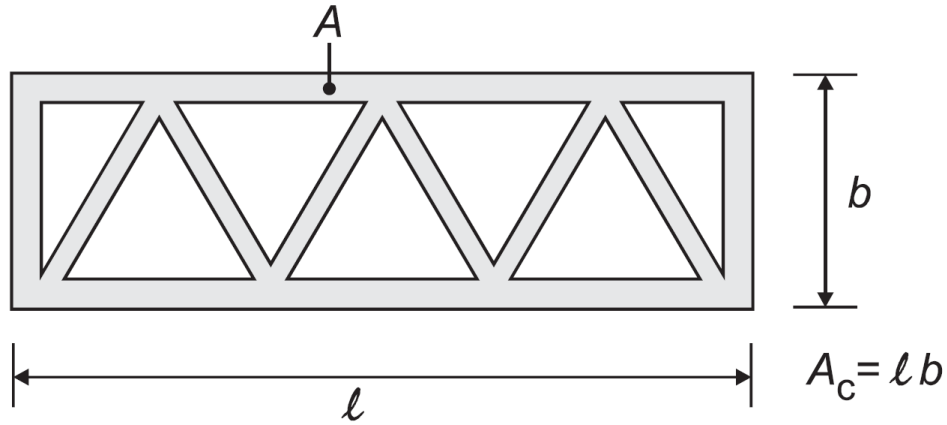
Projected area A and envelope area A_c from EC1 figure 7.37. In the context of our model the objects that make up A are the beams, columns, slabs and walls when viewing the model in elevation.
